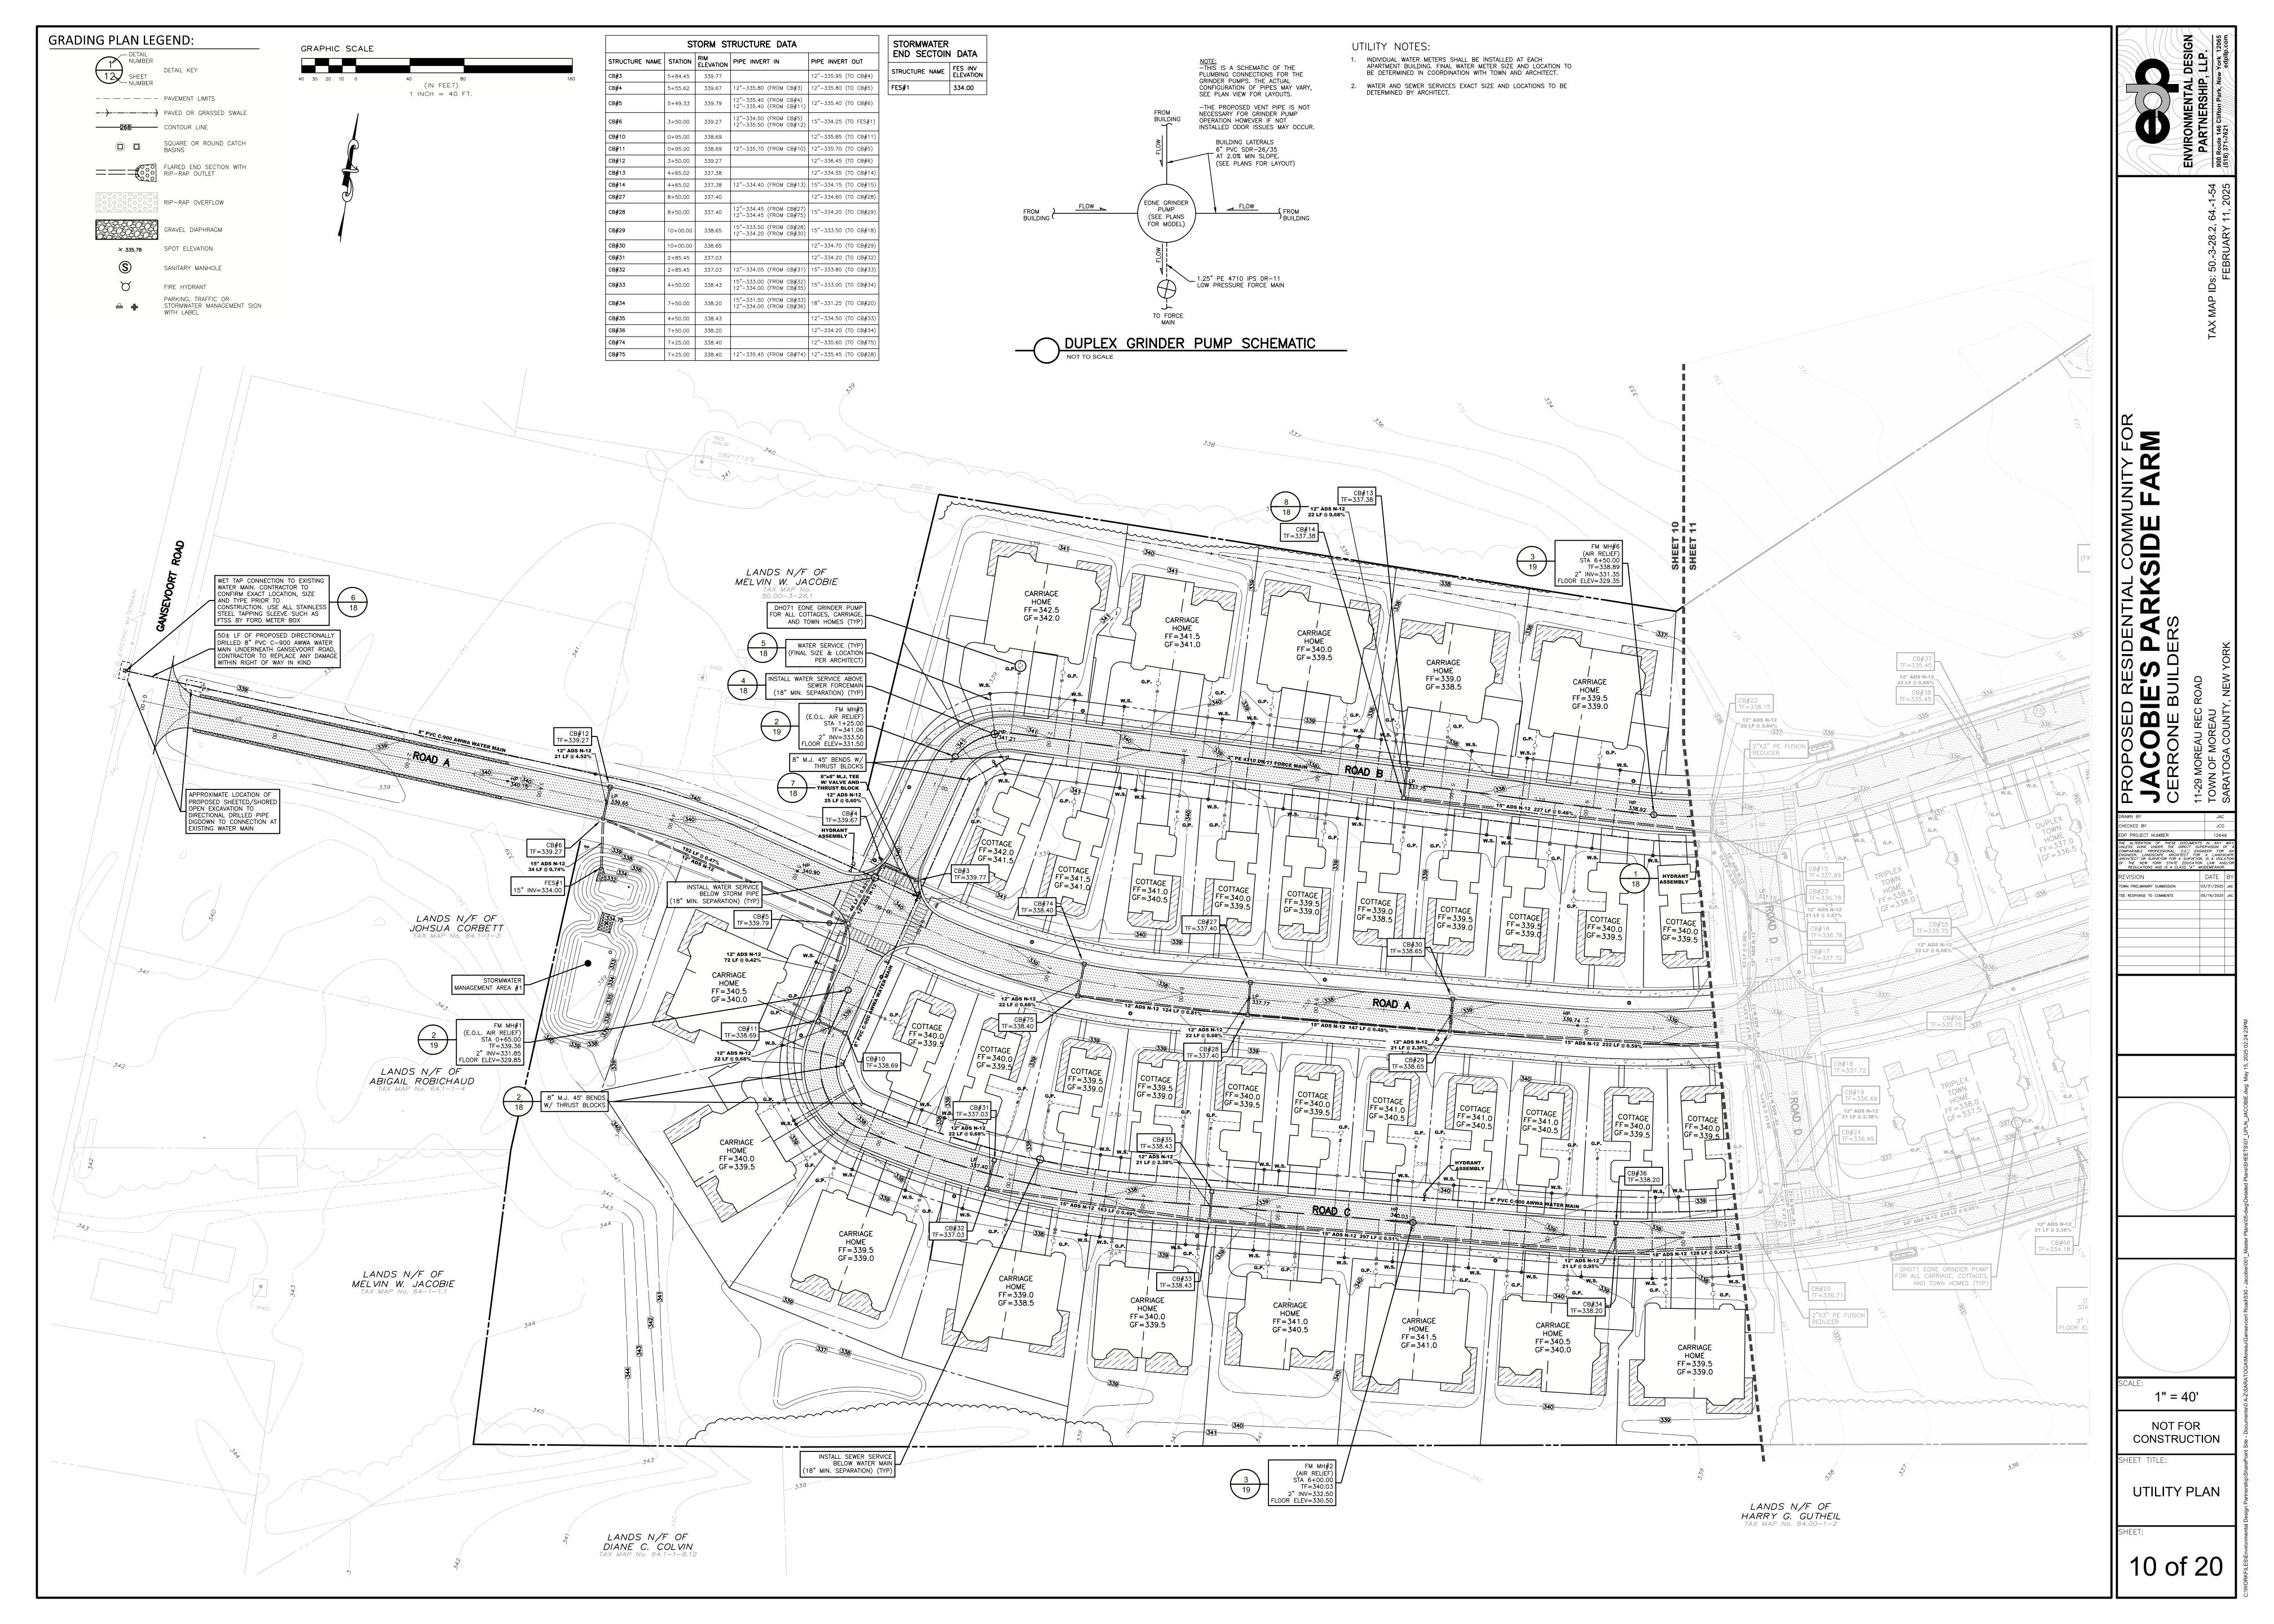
EXHIBIT "F" PROJECT UTILITY PLANS AND DETAILS
